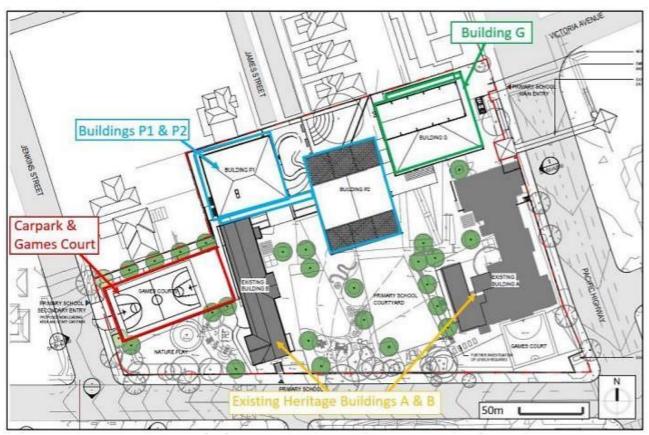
Chatswood Public School Site Plan (Source: RtS 2020)
